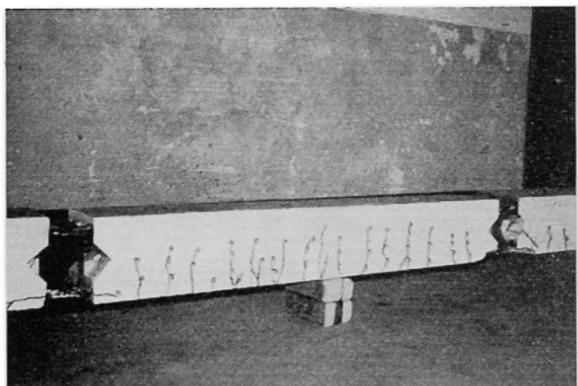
A beam made as shown in Fig. 4 after the test. The safety factor figured on the design load was 1.5, on the building load about 3.
